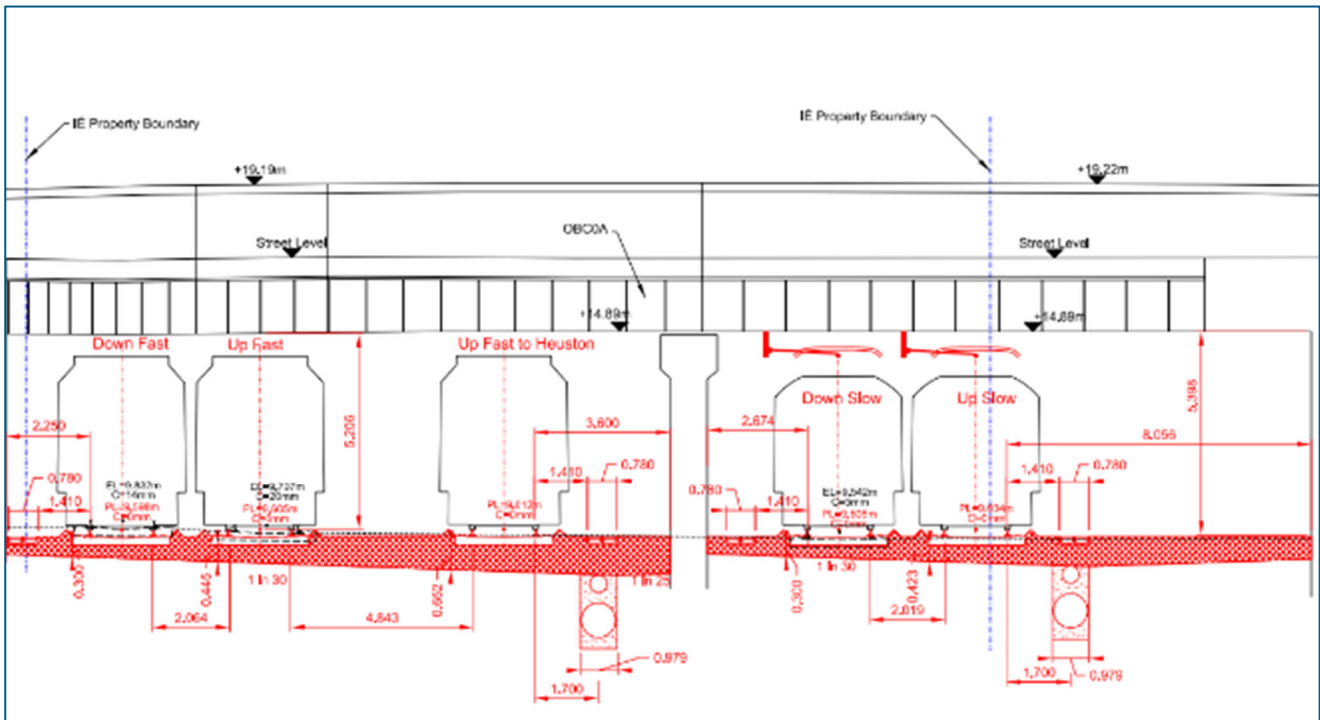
St John's Road Bridge (OBC0A) – Cross Section at Ch 9+312, View Facing West
